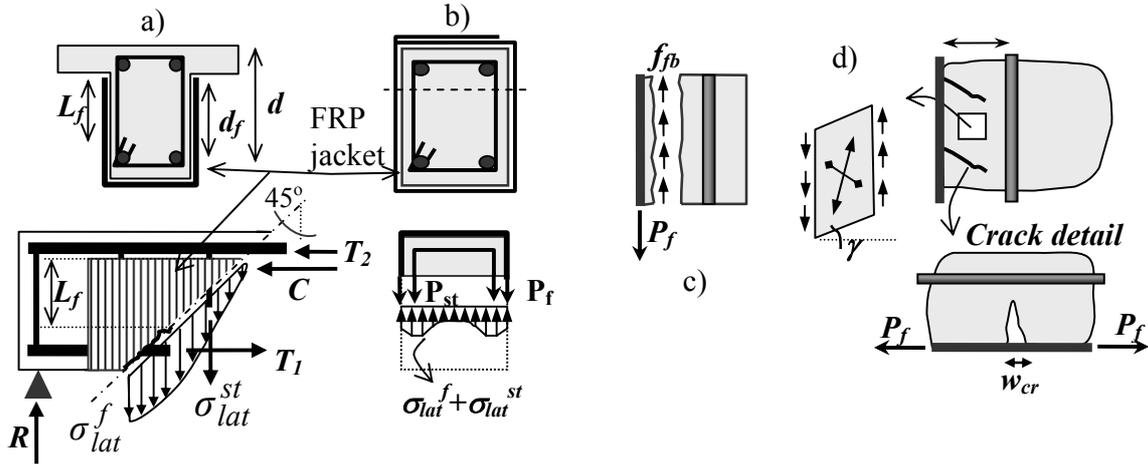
a) Free body diagram of FRP wrapped member at a shear crack plane, b) stress state of FRP strengthened rectangular cross section, failure of open jacket c) by delaminating from concrete and b) by diagonal tension of the cover.
